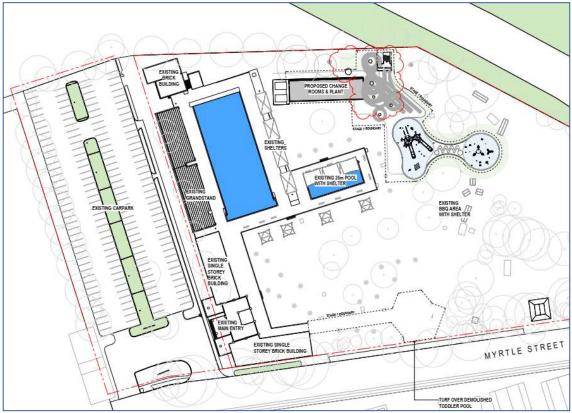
Excerpt of Approved Site Plan (DA-2021/187)
